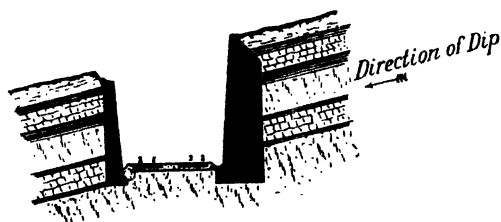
Cutting in Direction of Strike, with Supporting Walls.
